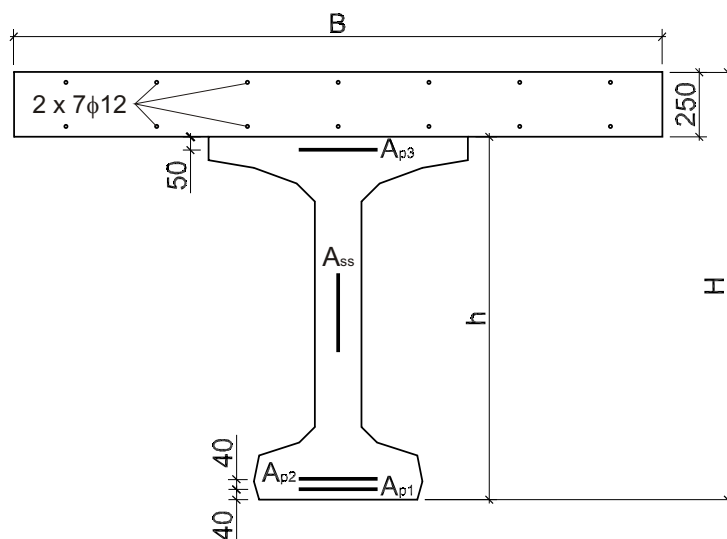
Cross-section of prestressed concrete I-shape girder (dim. [mm]).
